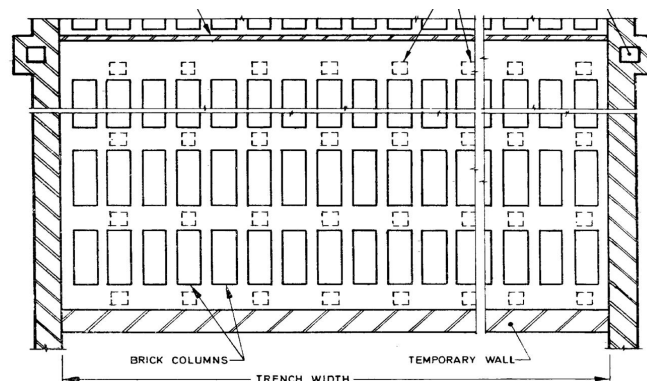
Plan showing details of feedholes and temporary wall for initiating fire
